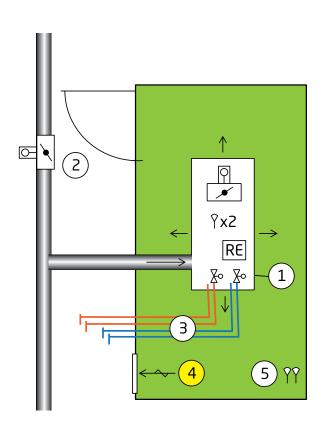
Typical room 1 shows ADAPT Parasol in an office room. Extract air leaves the room via a transfer air grille (balance at zone level)
